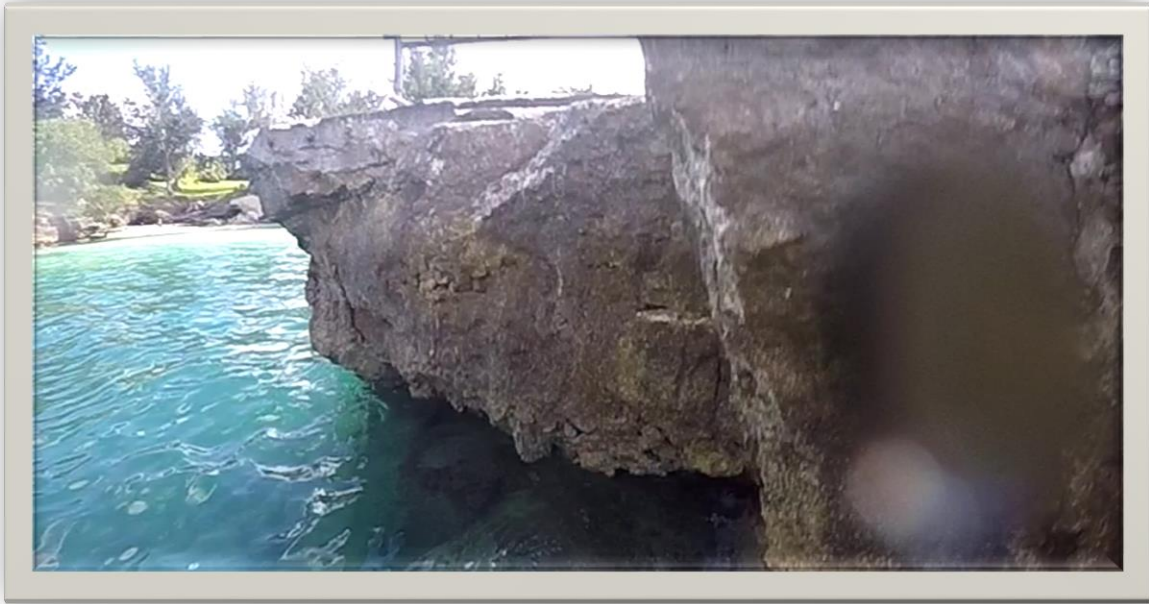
Eastern Face showing concrete overhang above a cavity below sea level.
